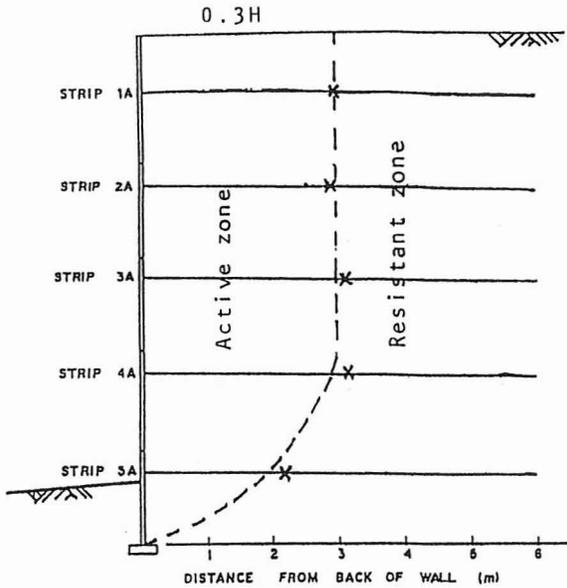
Locus of maximum tensile forces (Steel strip reinforced wall)
